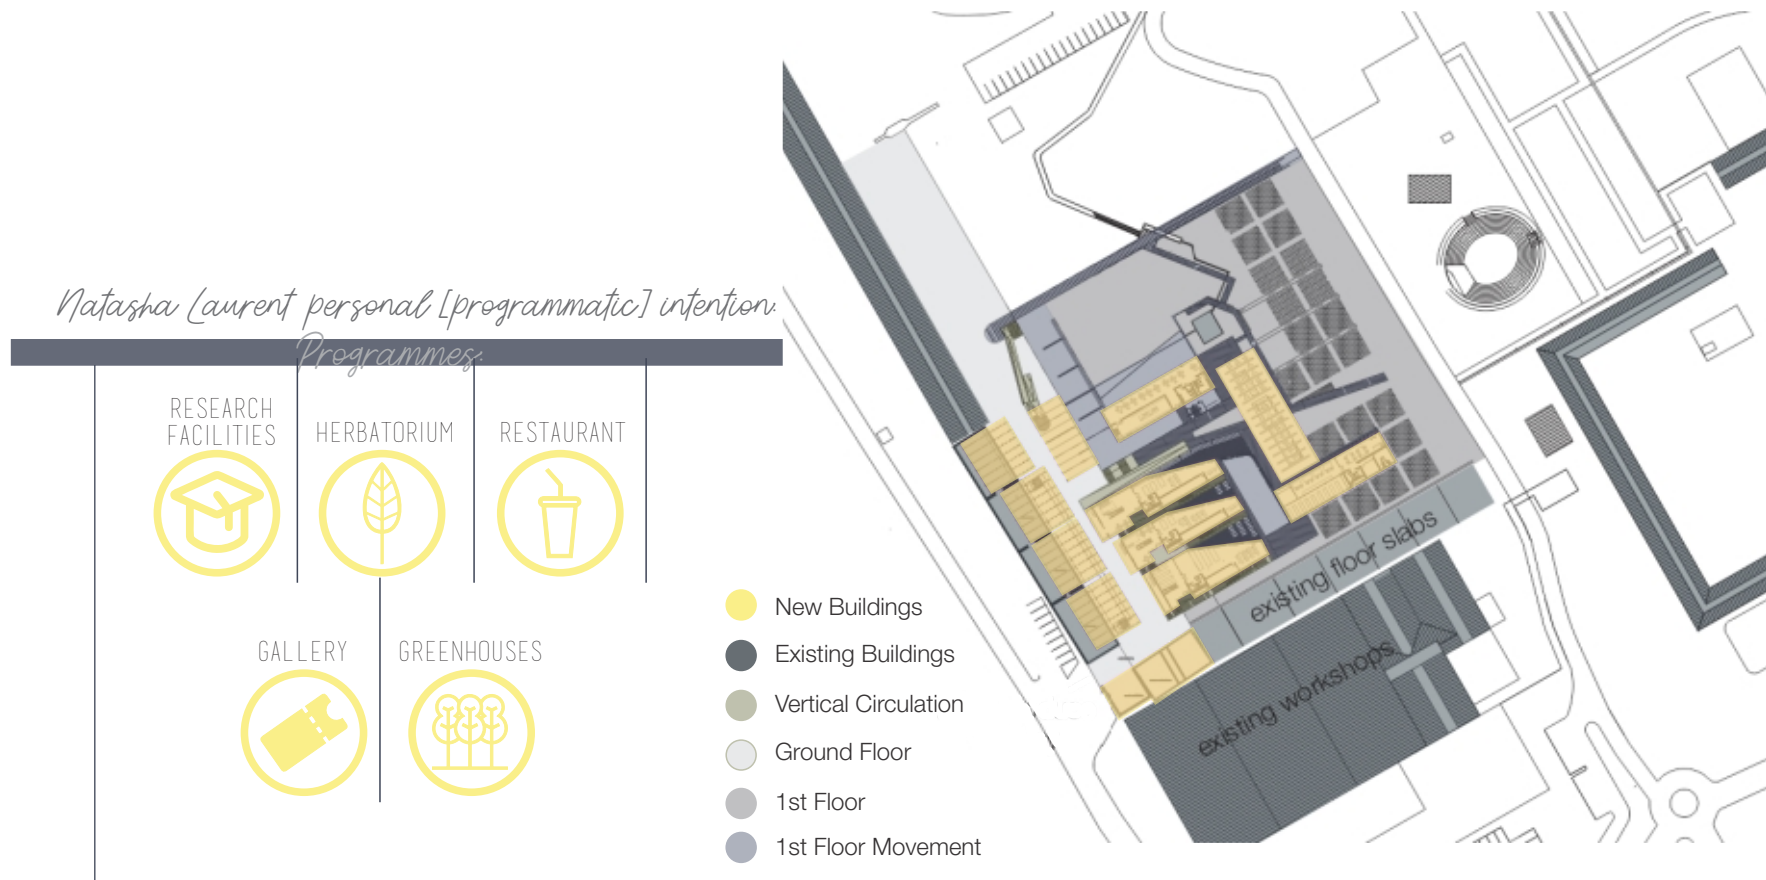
Site Plan indicating design by Natasha Laurent in 2014 (Author 2018)
